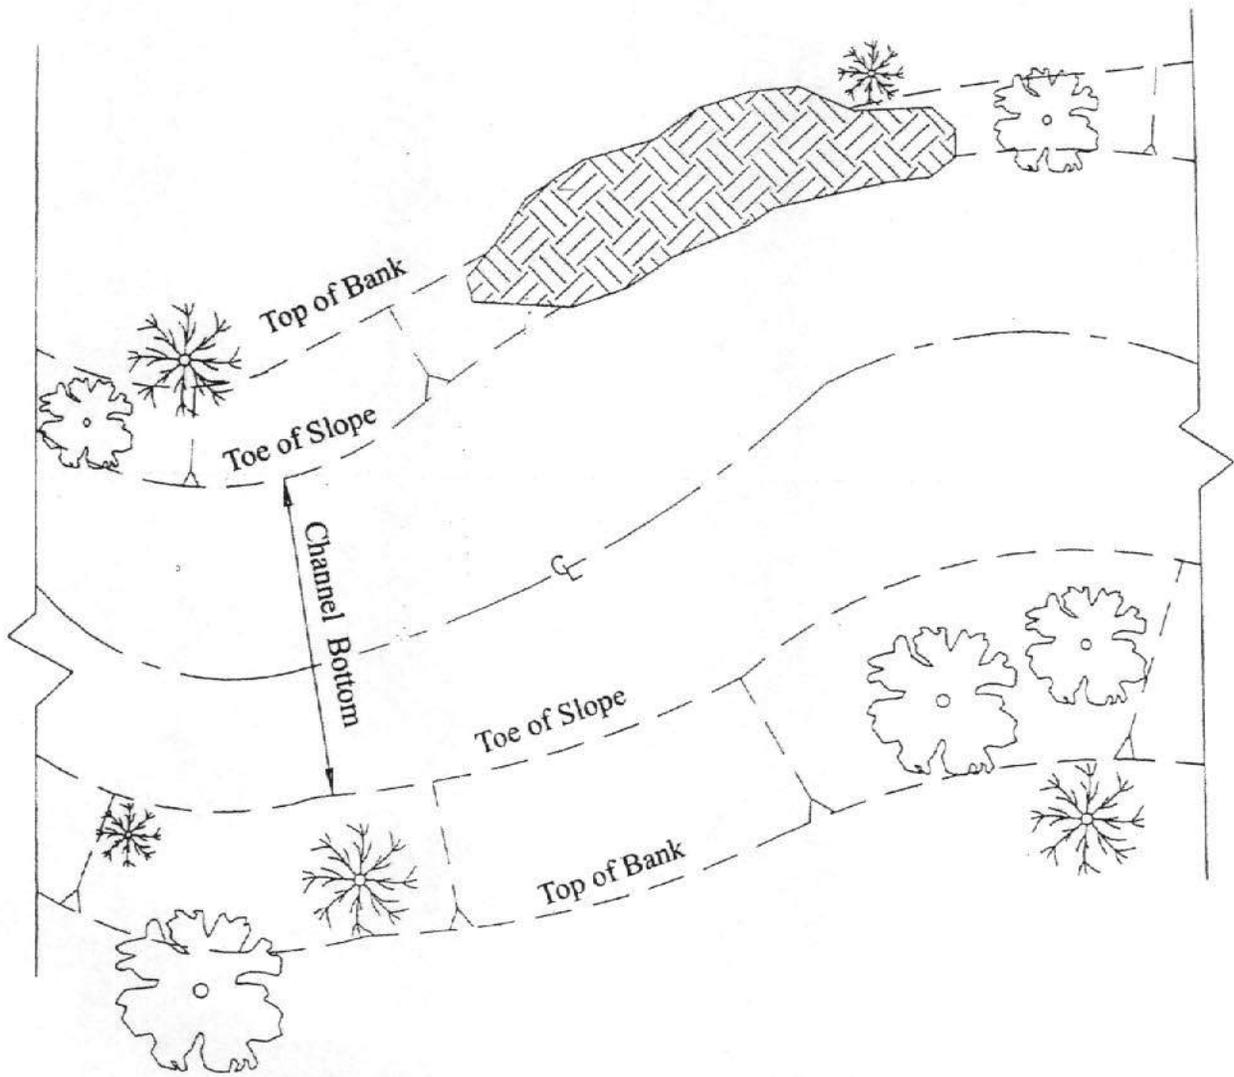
Terms Defining Channel Structure (Aerial view)
